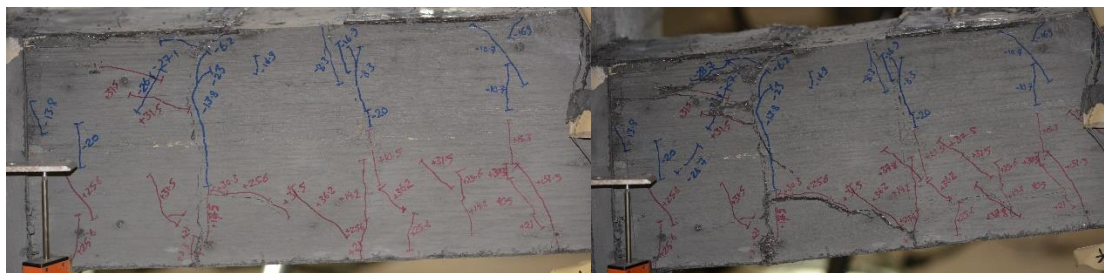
88 Cracking in UHP-FRC #4 specimen (steel fibers) with BFRP bars at 5% drift (left) and 9% drift (right)
